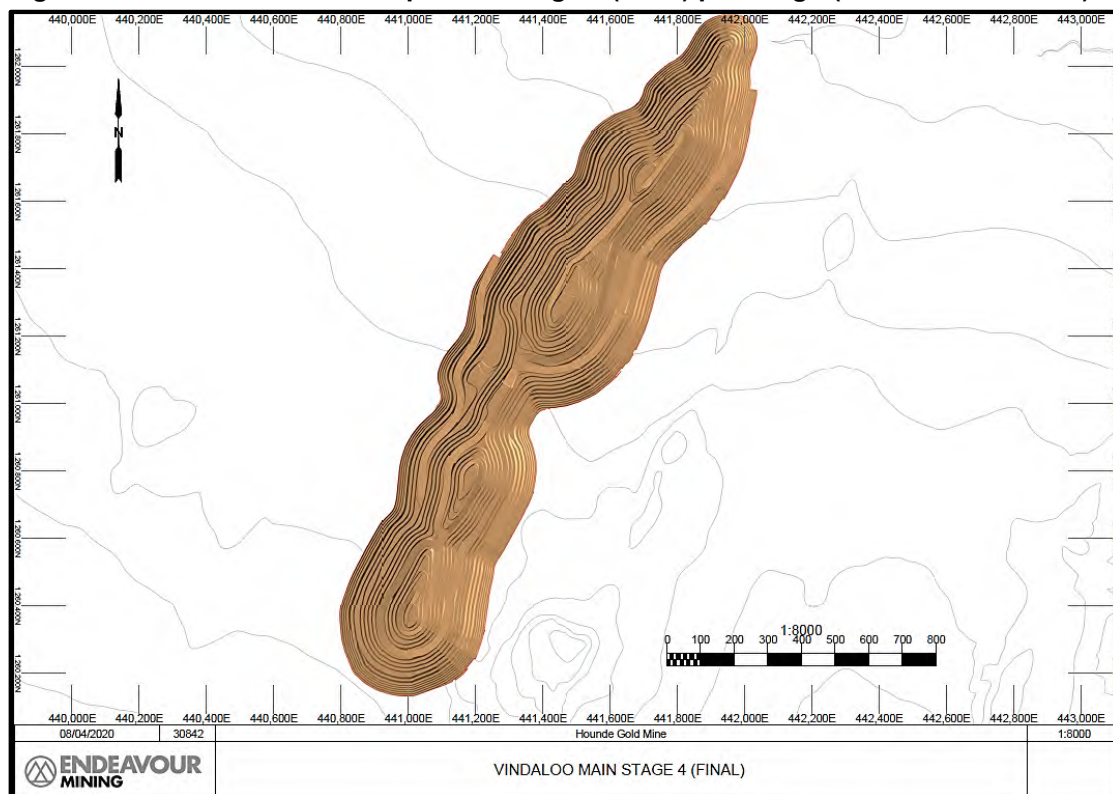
Vindaloo Main Open Pit: stage 4 (Final) pit design (source: Endeavour)
